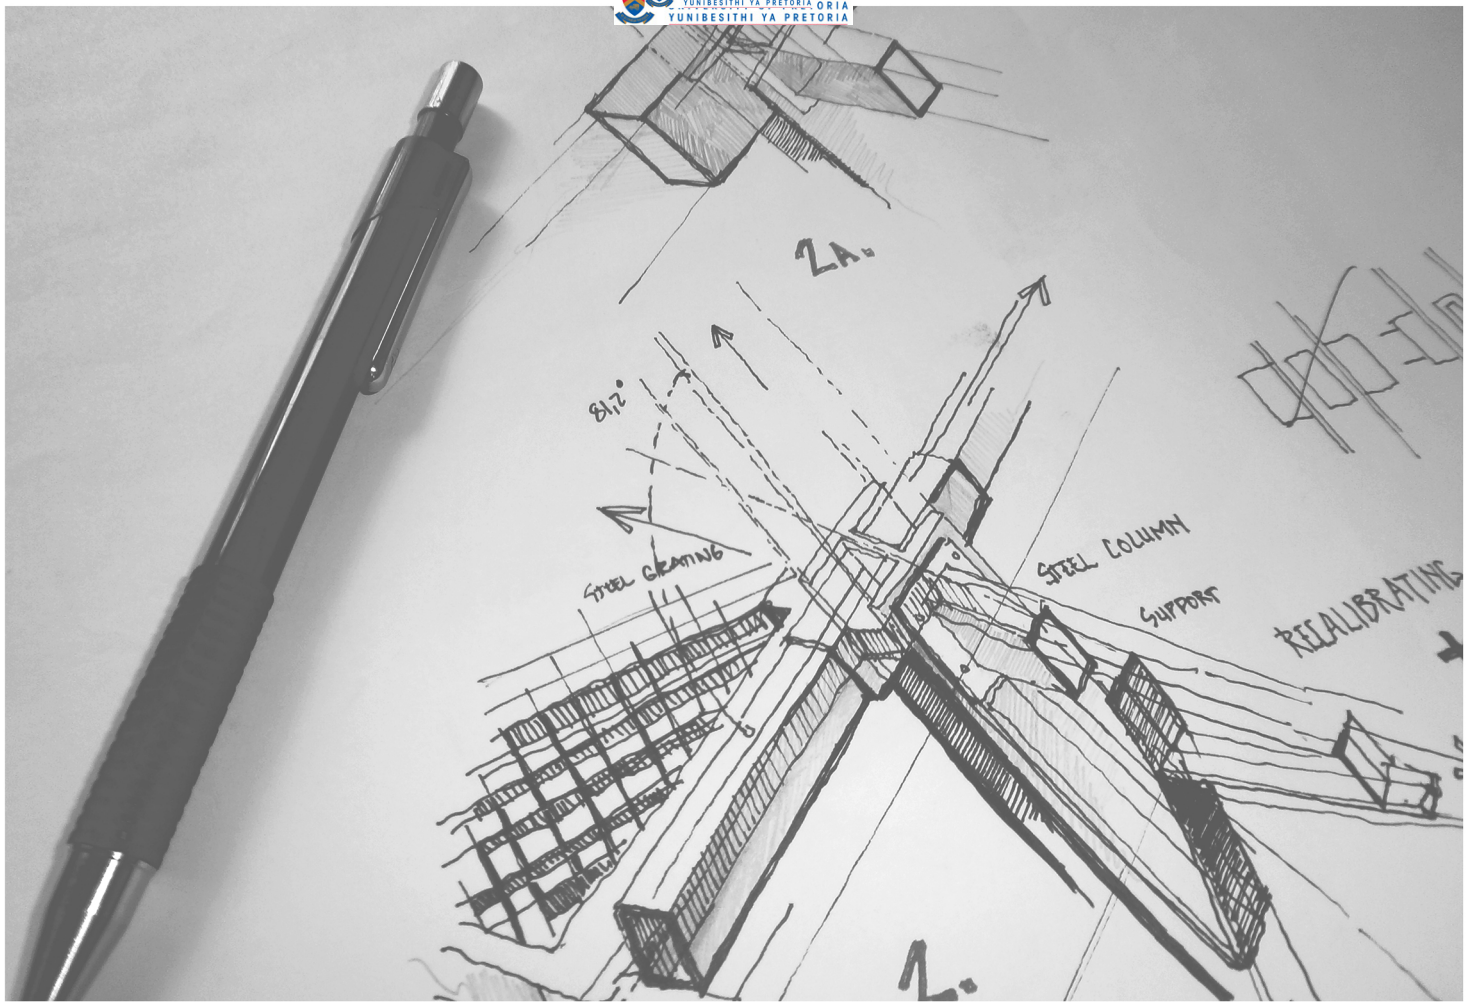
Exploration of detailing | bicycle pergola construction | beam to beam connection
